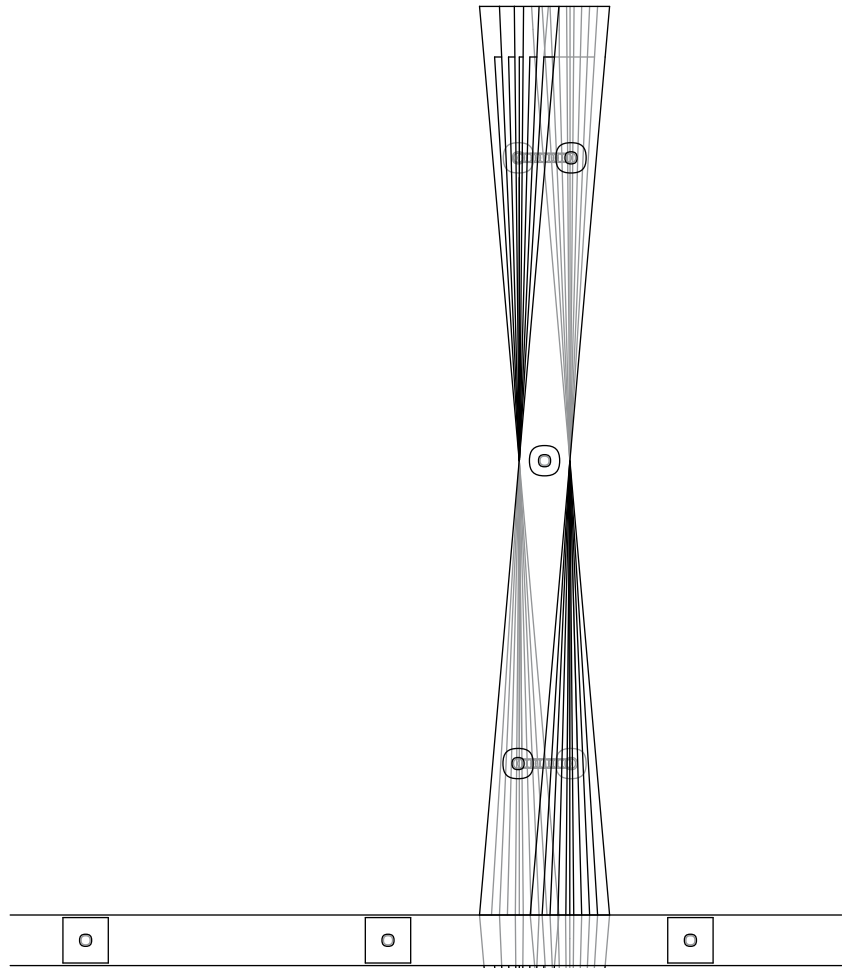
Drawings for a combination-type stress-laminated column with alternating straight and rotated layers.
